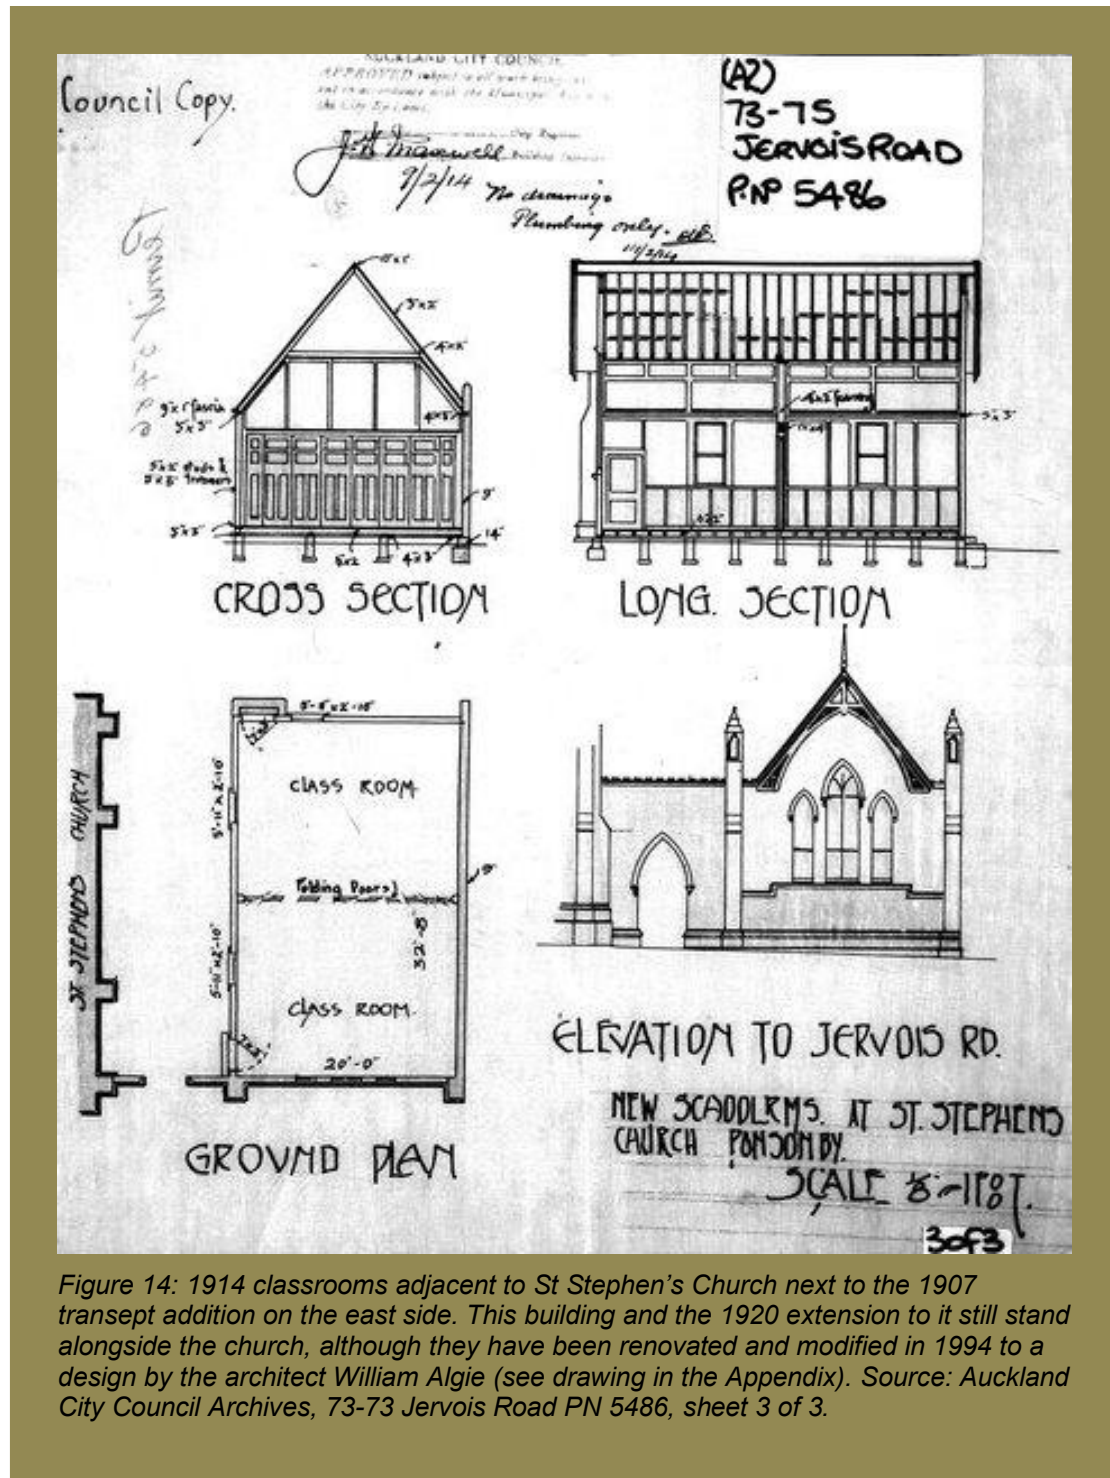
1914 classrooms adjacent to St Stephen's Church next to the 1907 transept addition on the east side. This building and the 1920 extension to it still stand alongside the church, although they have been renovated and modified in 1994 to a design by the architect William Algie (see drawing in the Appendix). Source: Auckland City Council Archives, 73-73 Jervois Road PN 5486, sheet 3 of 3.
